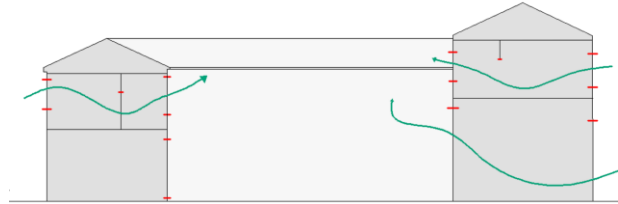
Schematic section of Manastiri Inn, showing the small openings on the outside wall and big openings on the interior part simulating ventilation
